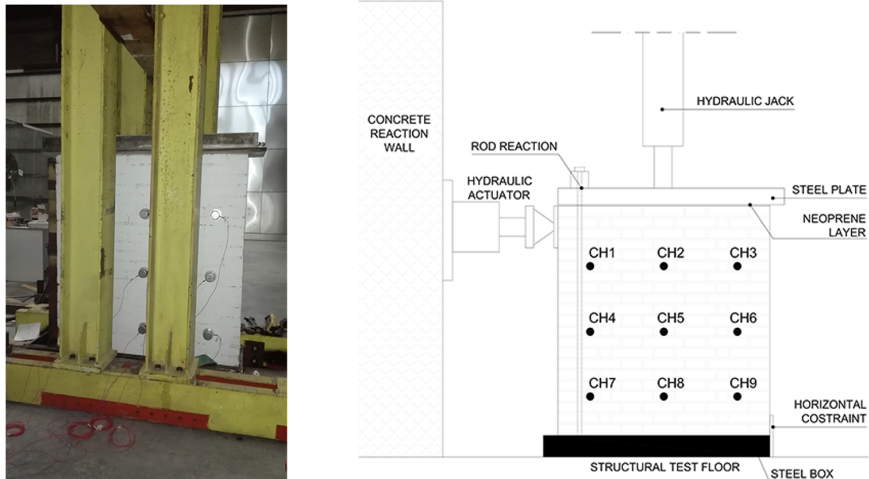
Masonry wall test. Location of the nine accelerometric sensors.
